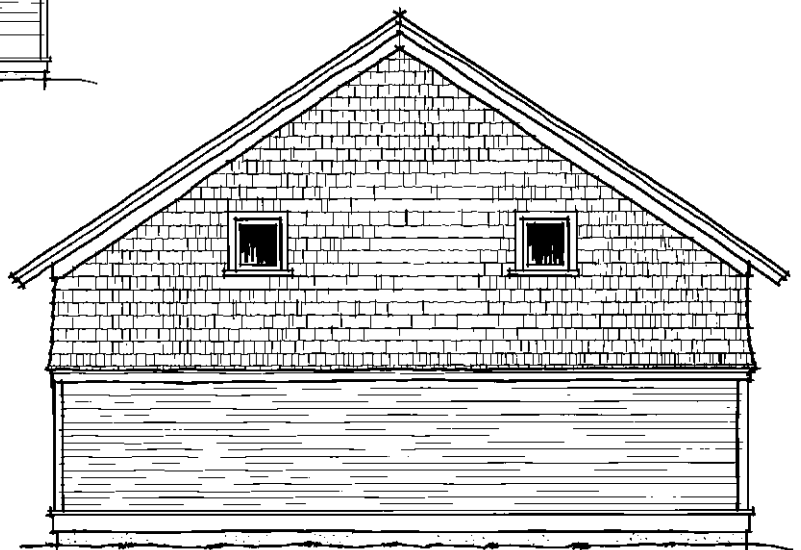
The gable-end elevation above, with its two undersized windows, provides no sense of scale; from a distance it's difficult to tell whether the structure is a house or a larger commercial building. Changing siding at the level of the second floor is a low-cost design improvement, providing the viewer with a clue to the structure's height.
